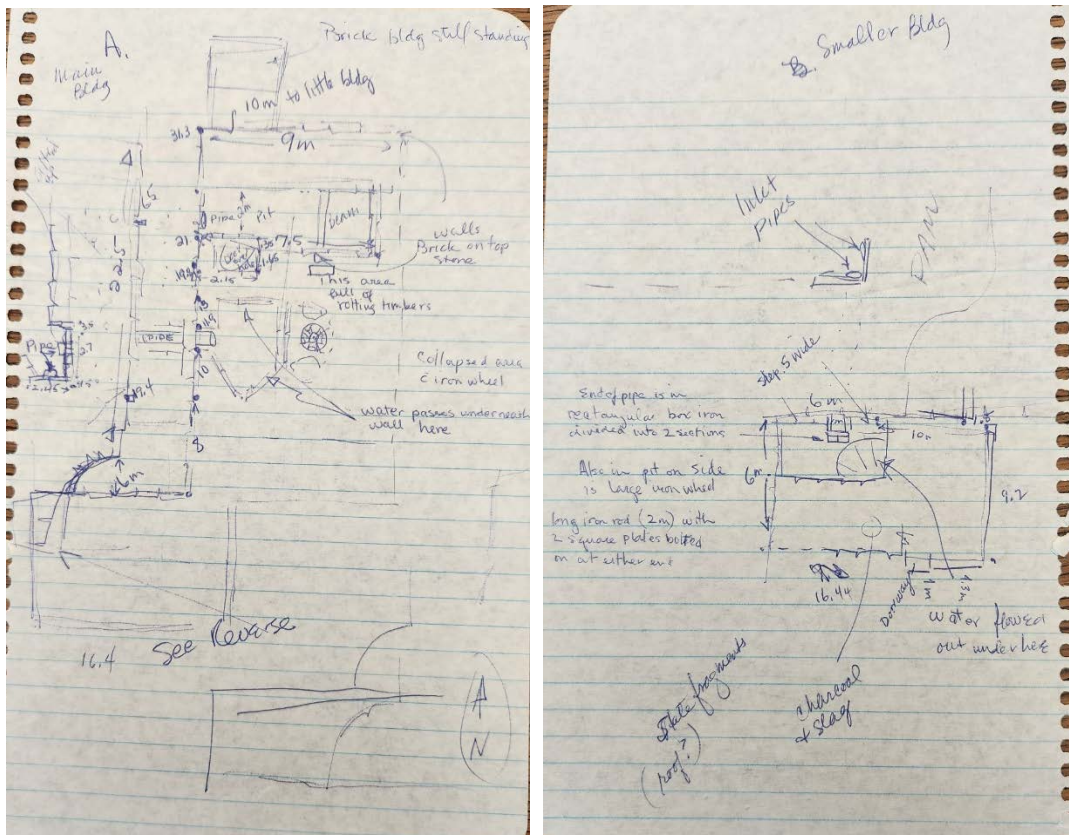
and b. Sketch of reservoir canal dike and large foundation at Mill #1 in 1978 (L); sketch of small foundation at Mill #1 in 1978 (R). Wesleyan Archaeology Labs.
